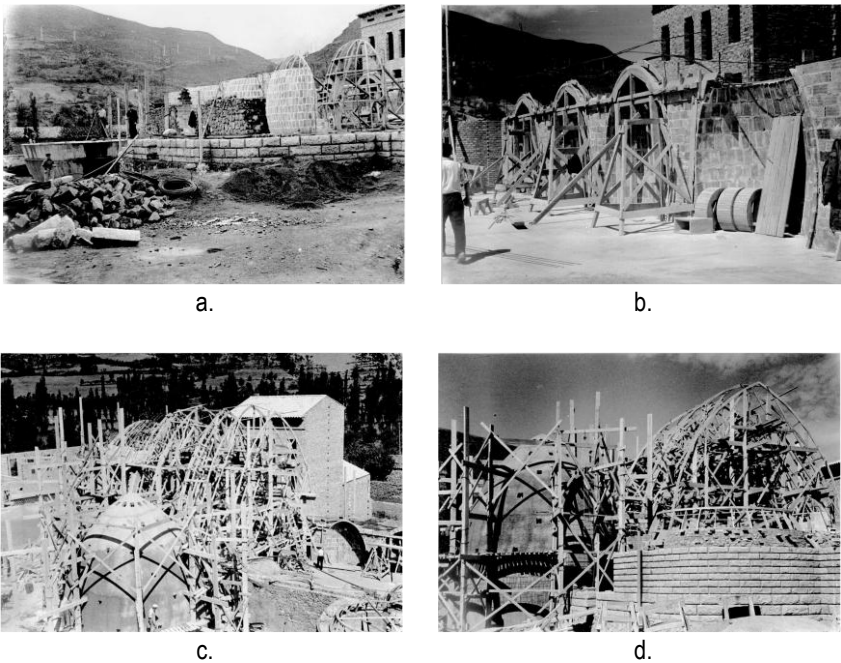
Pont de Suert Church. a y b. Lateral nave chapels construction, views from outside and inside respectively. c y d. Main nave construction. (Source: *Instituto de Ciencias de la Construcción Eduardo Torroja*)
